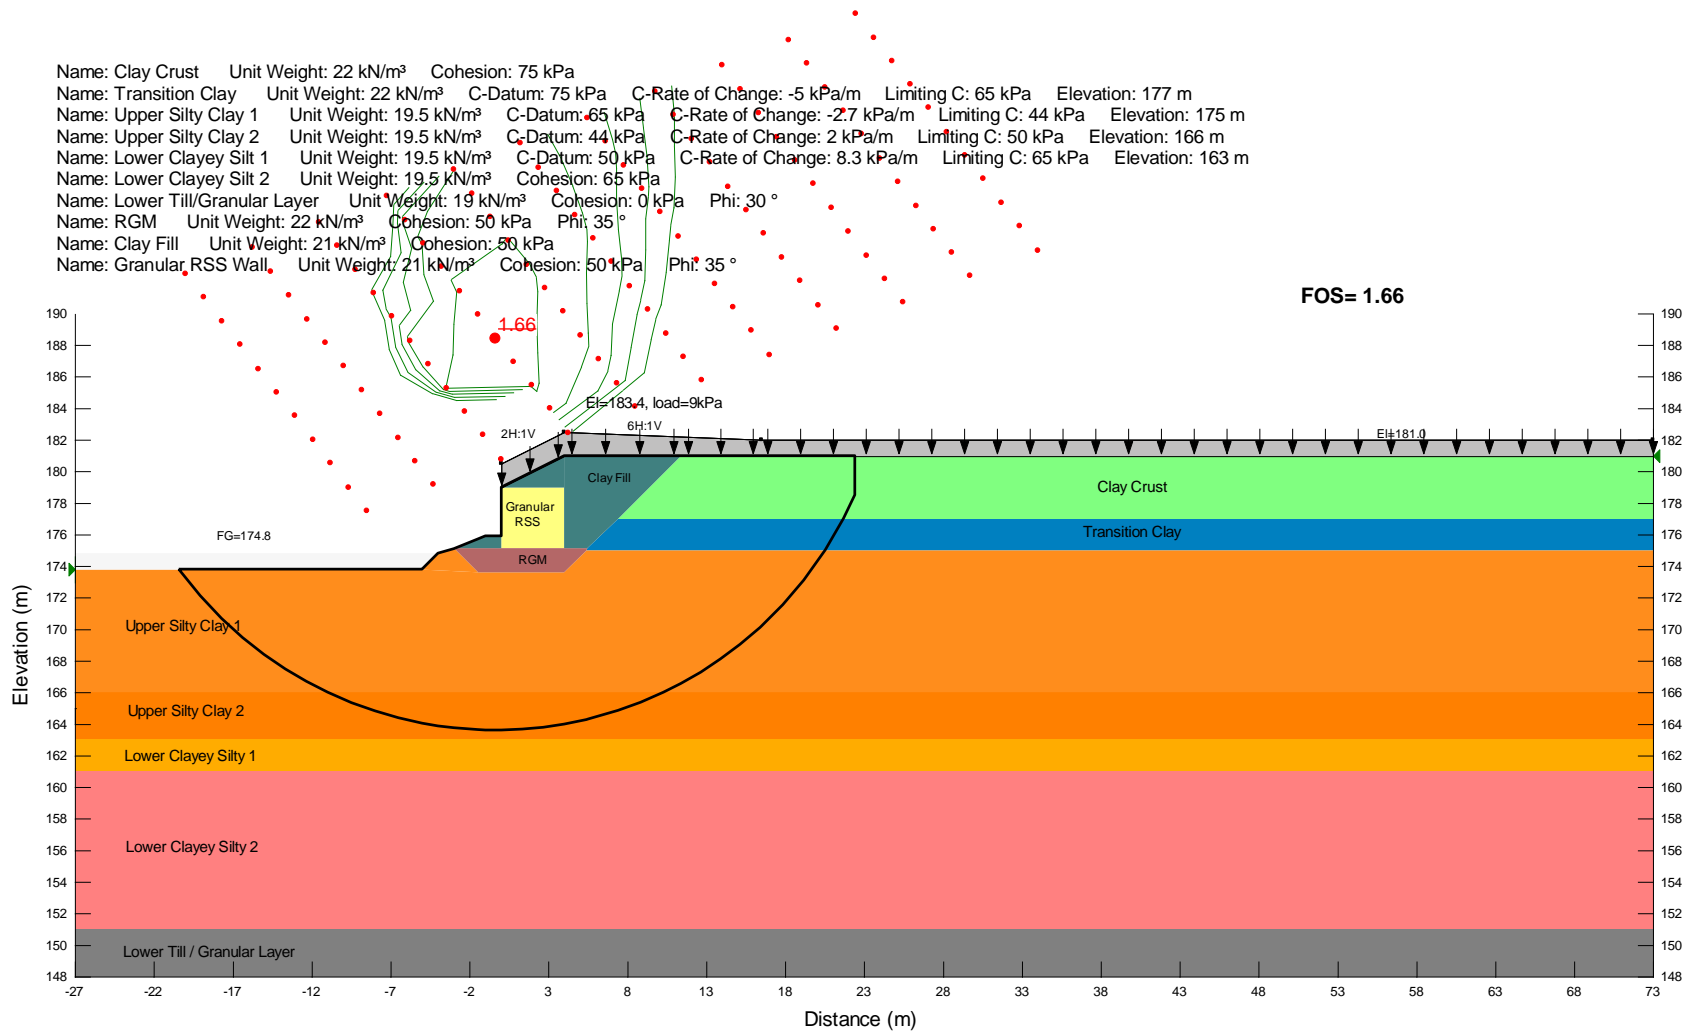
Slope Stability –Short Term – South Abutment Wing Wall - Station 10+450L Hwy 401
